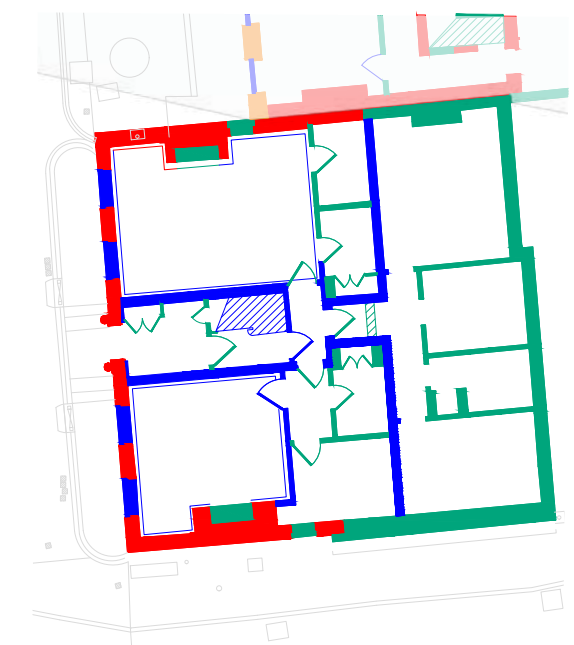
No. 790 Ground Floor Heritage Significance Plan
